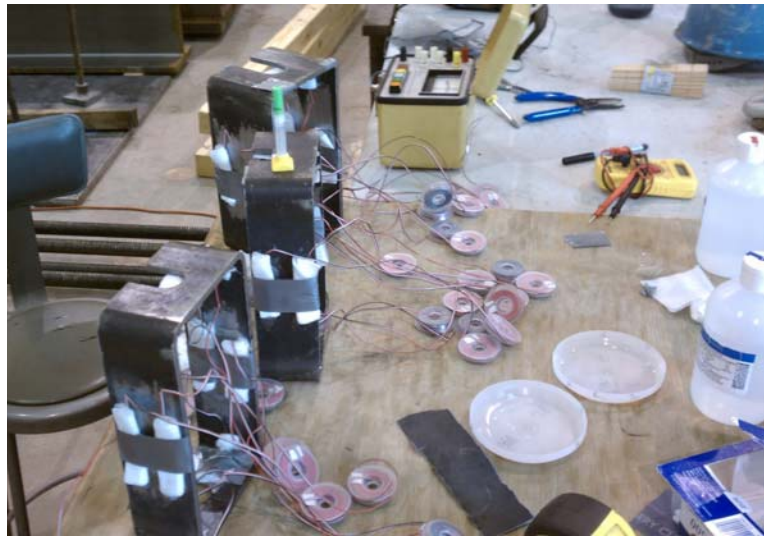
HSS Coupler Strain Gage Instrumentation
